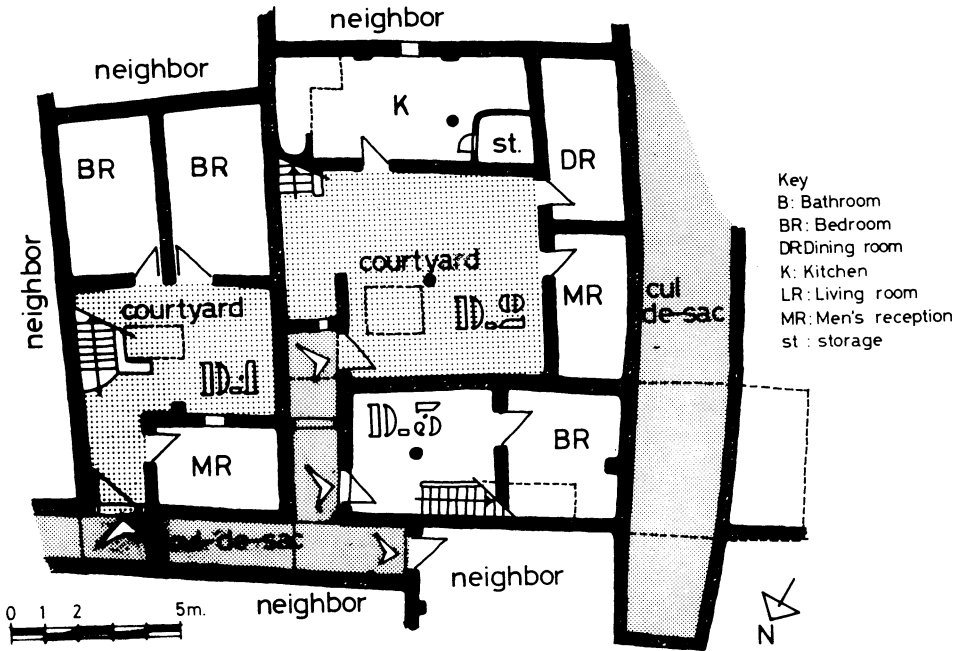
Ground floor plans of A cluster of houses-Sadous
